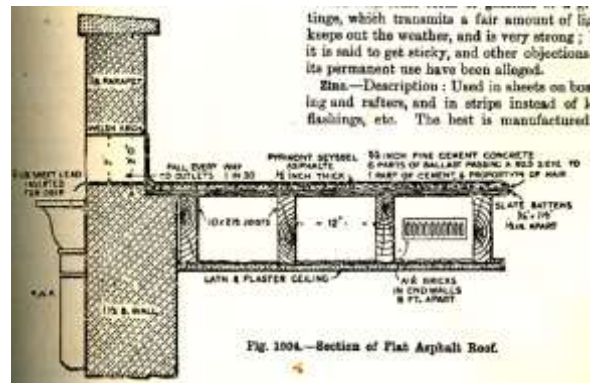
Typical cross section of a URM parapet and timber-framed roof diaphragm (after Adams [1], 261).
